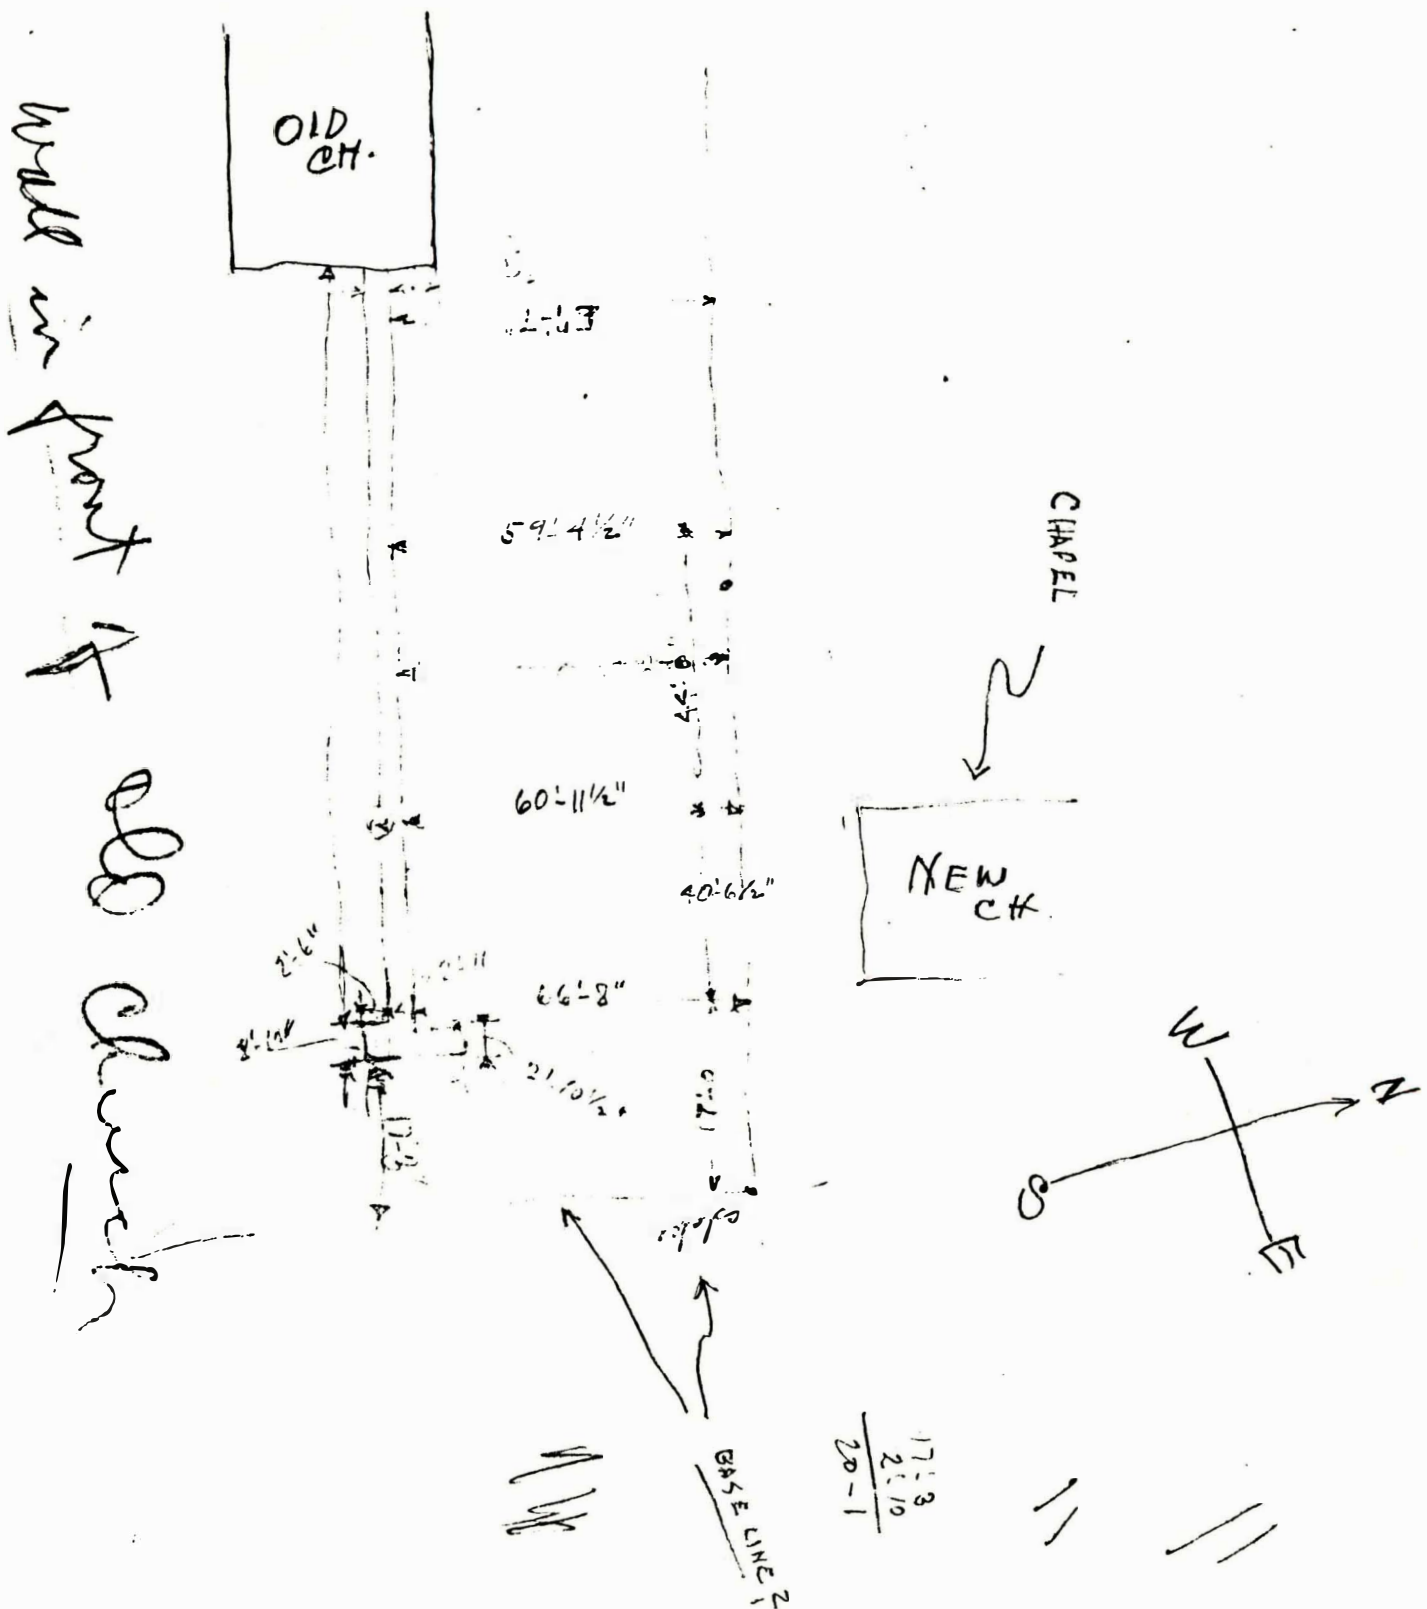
Plan of large church, showing foundations of wall extending to the north.
